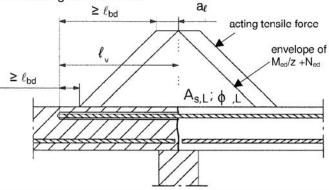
Overlapping joint at a foundation of a wall or column where the rebars are stressed in tension
